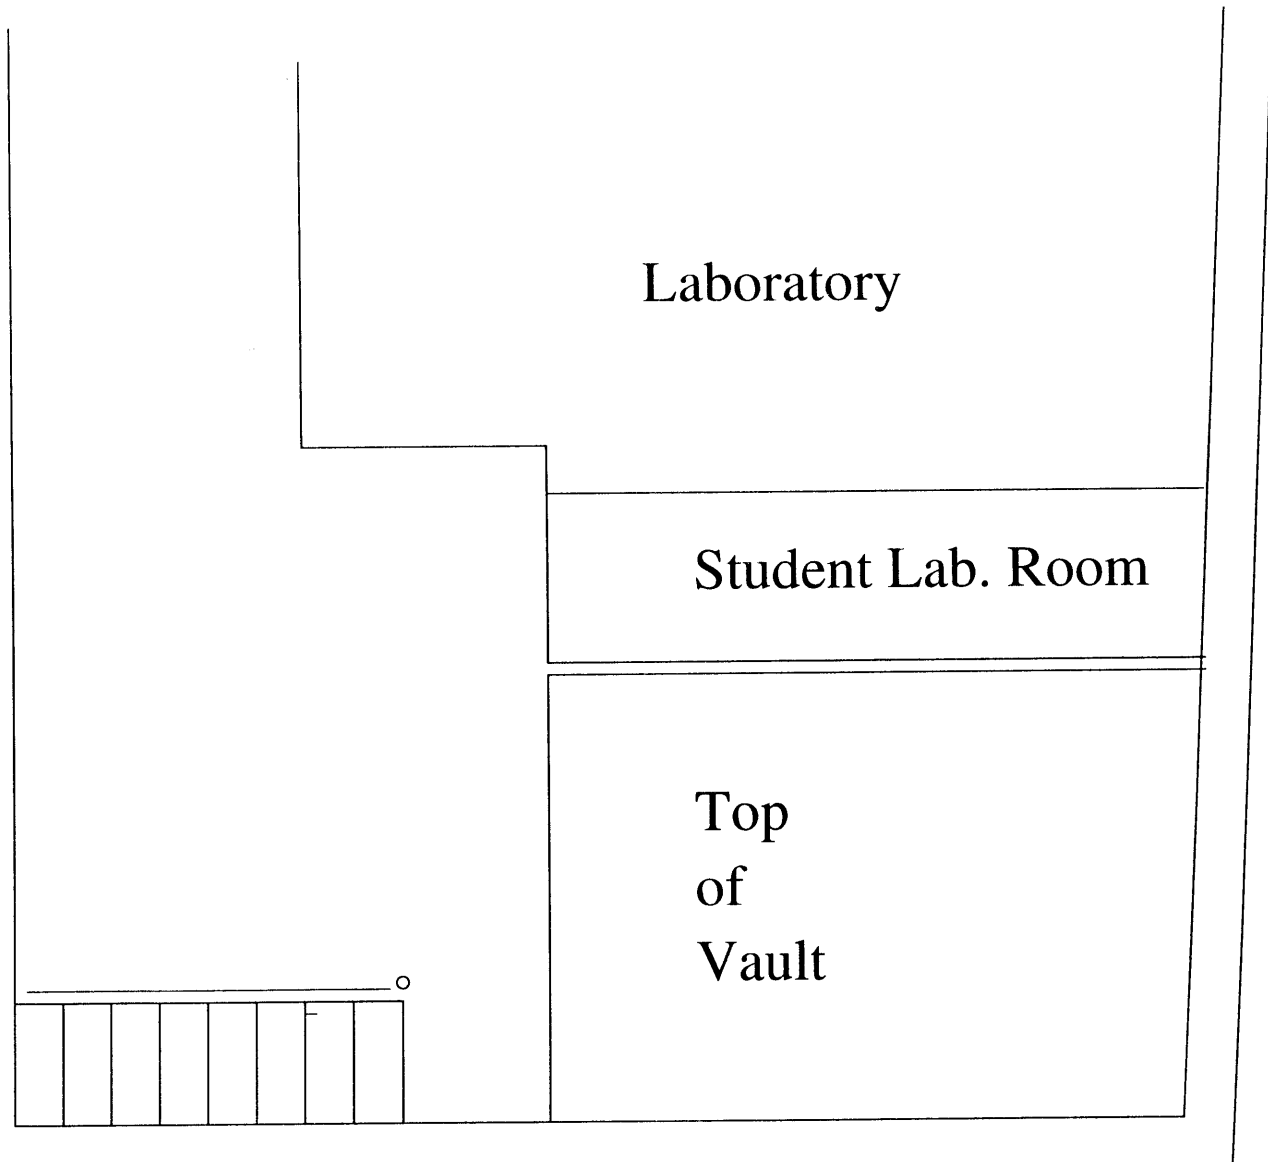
The ground floor of MIT building NW13, in the vicinity of the LABA facility. The vault is shown extending into this floor.
